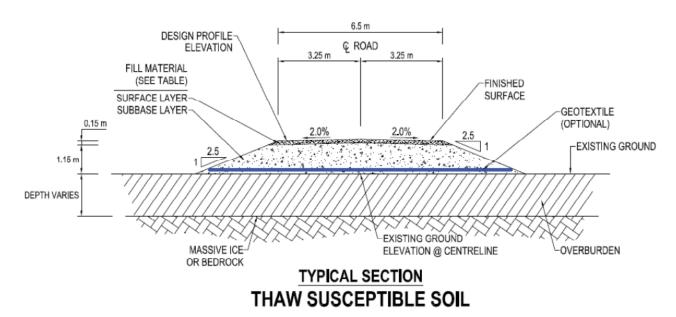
Typical Road Cross-section for Thaw Susceptible Soil
